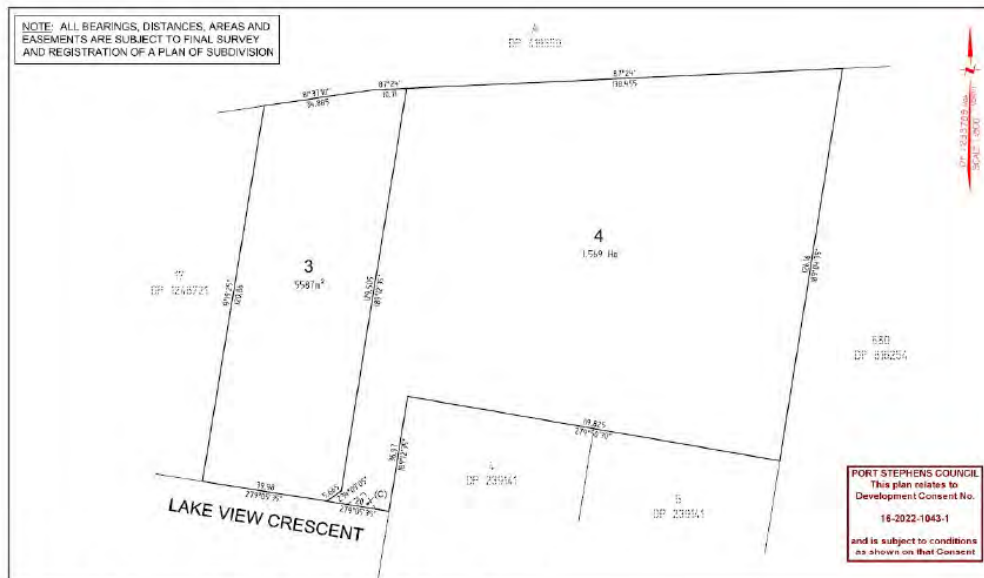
Approved Lot Layout DA 16-2022-1043-1
